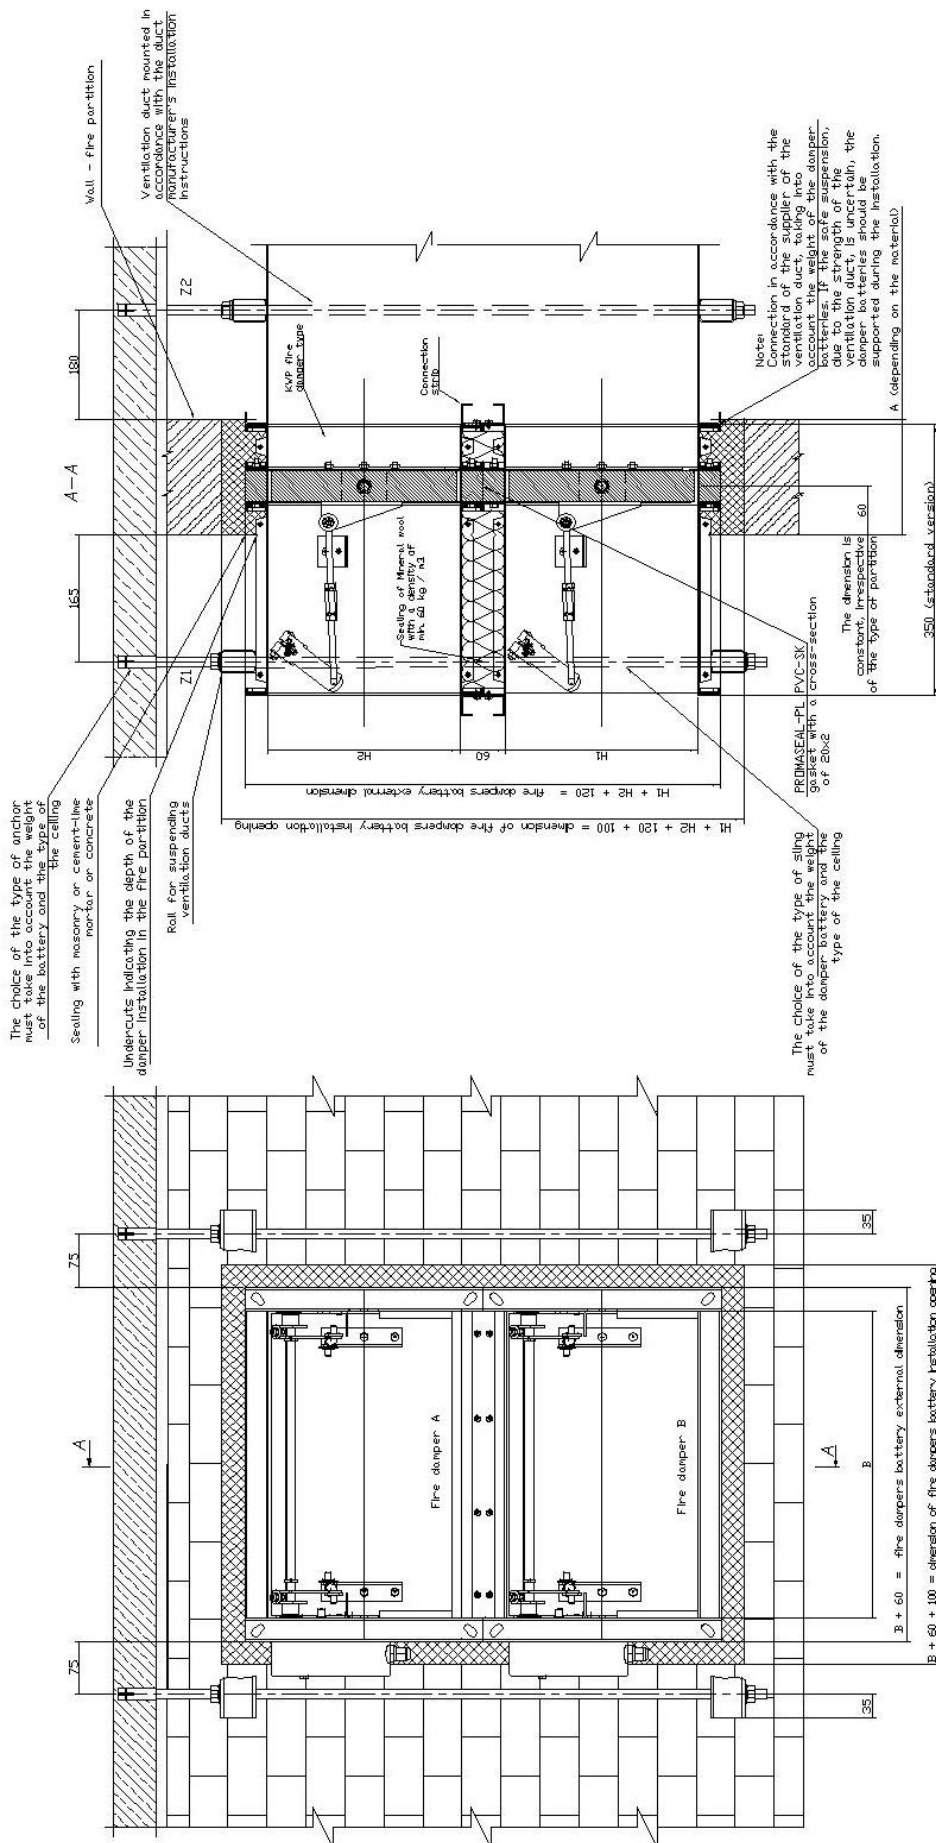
Installation of a battery consisting of two fire dampers KWP in vertical arrangement in ceiling
